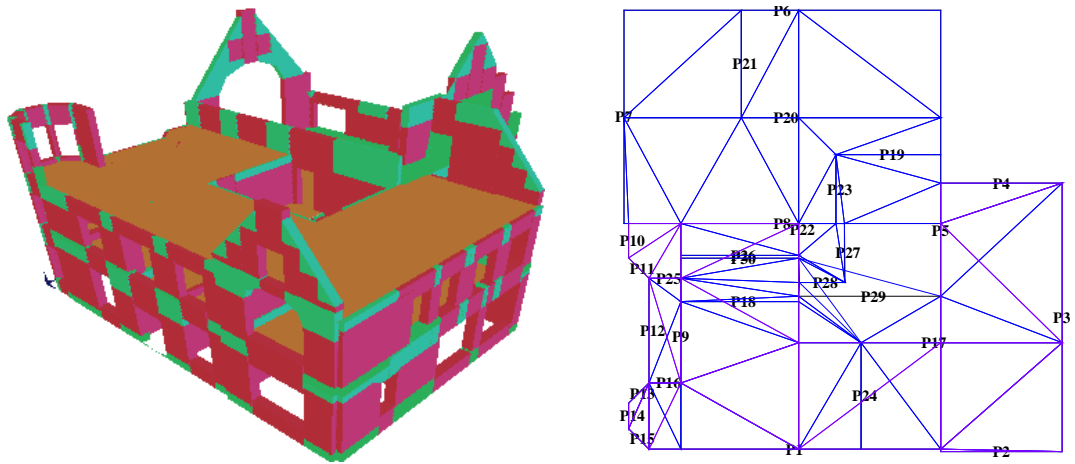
Modeling of the building: 3D macro-element model and floor model plan.
